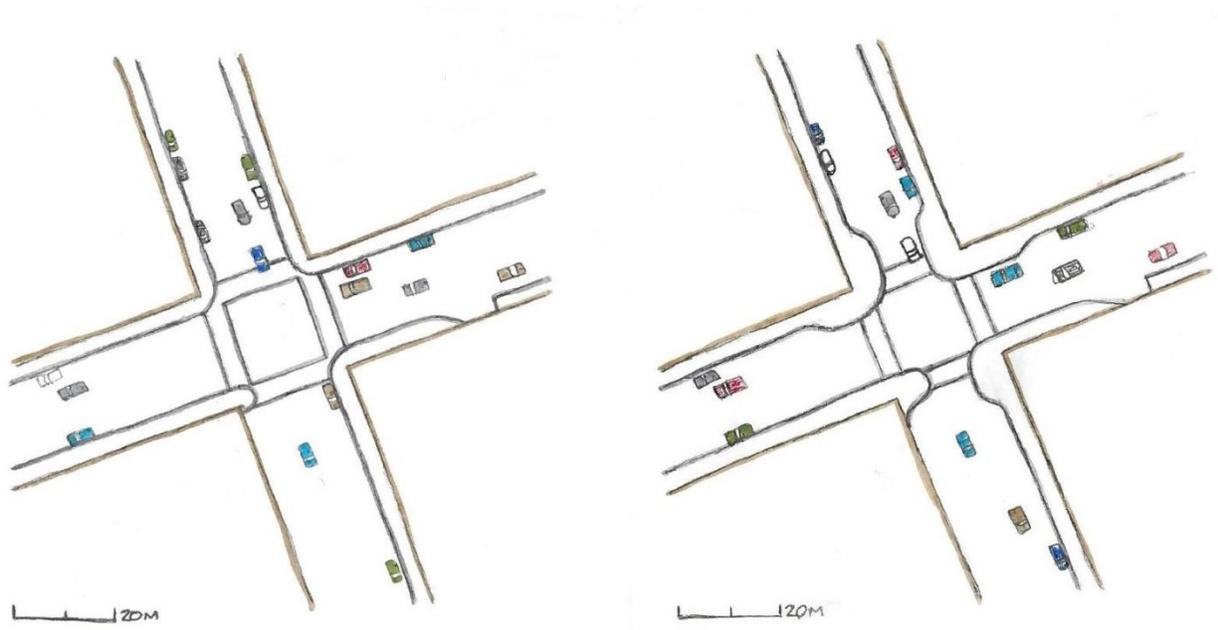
Maps of Garry and St. Mary intersection, existing conditions (left) and proposed curb extensions (right)
